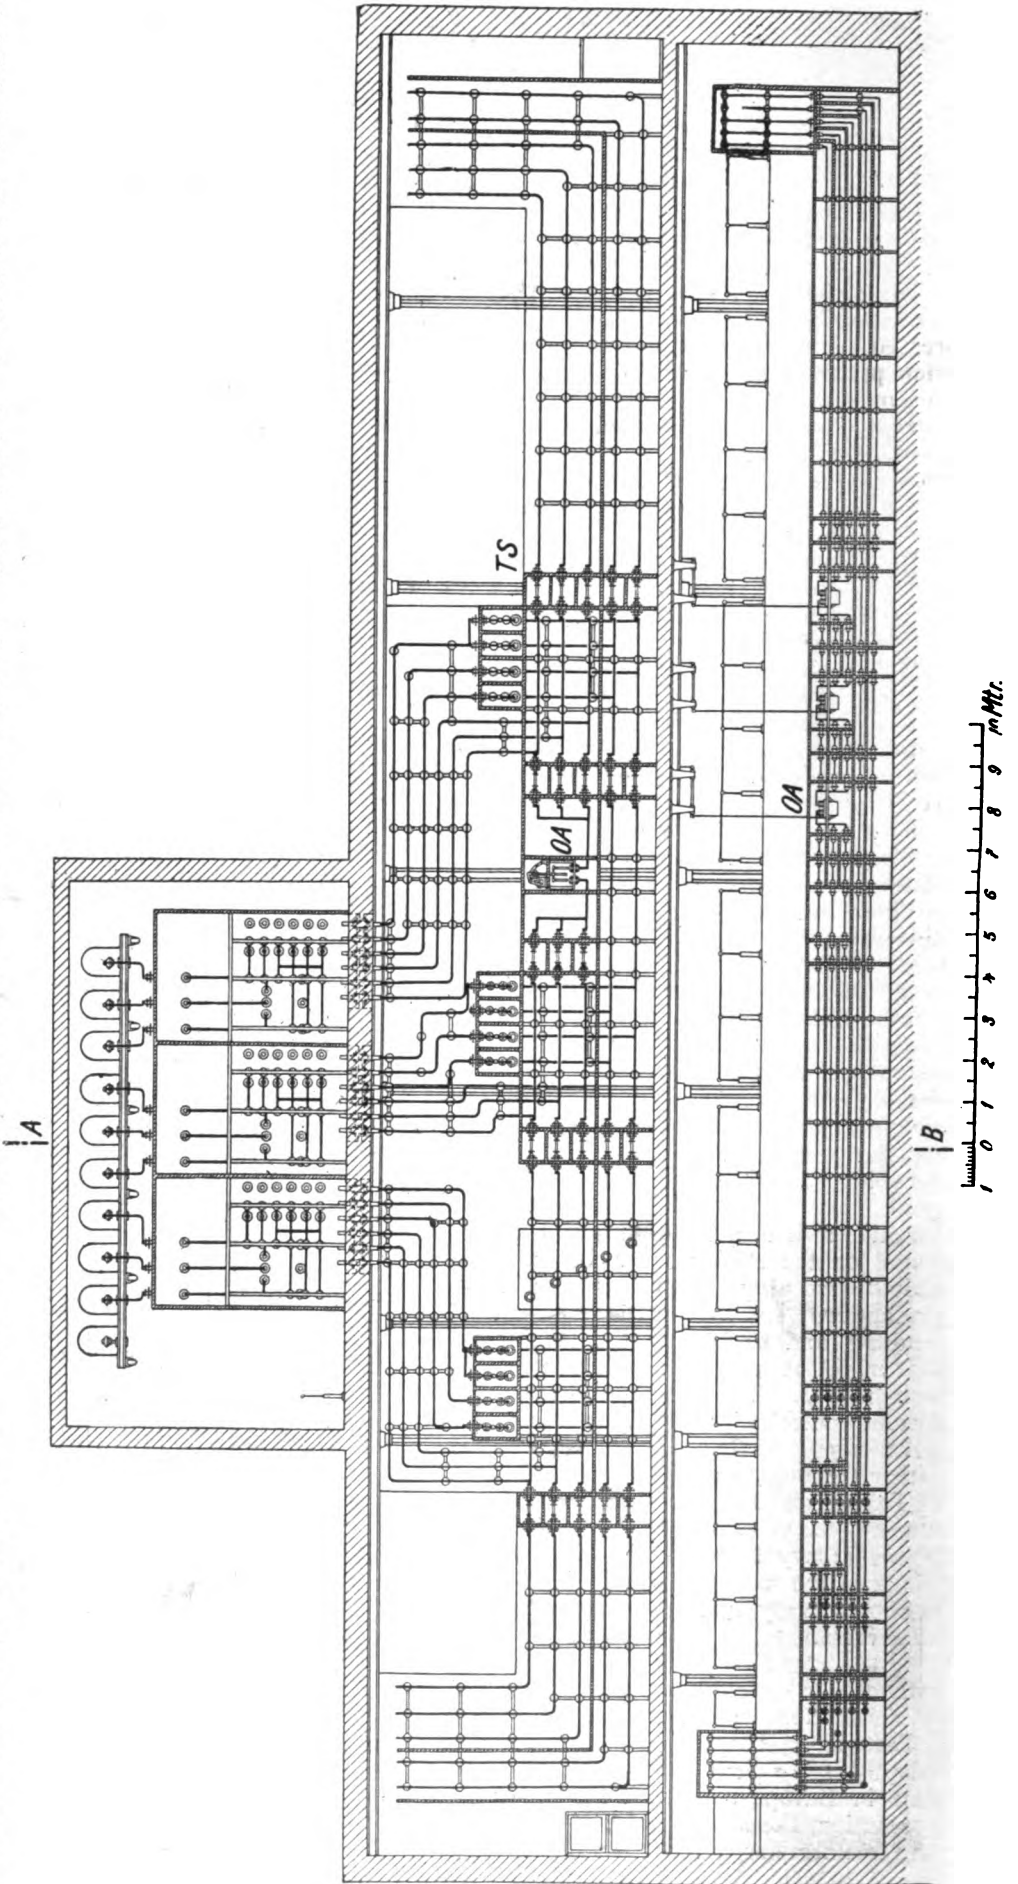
HORIZONTAL SECTION—OBERMATT GENERATING STATION
